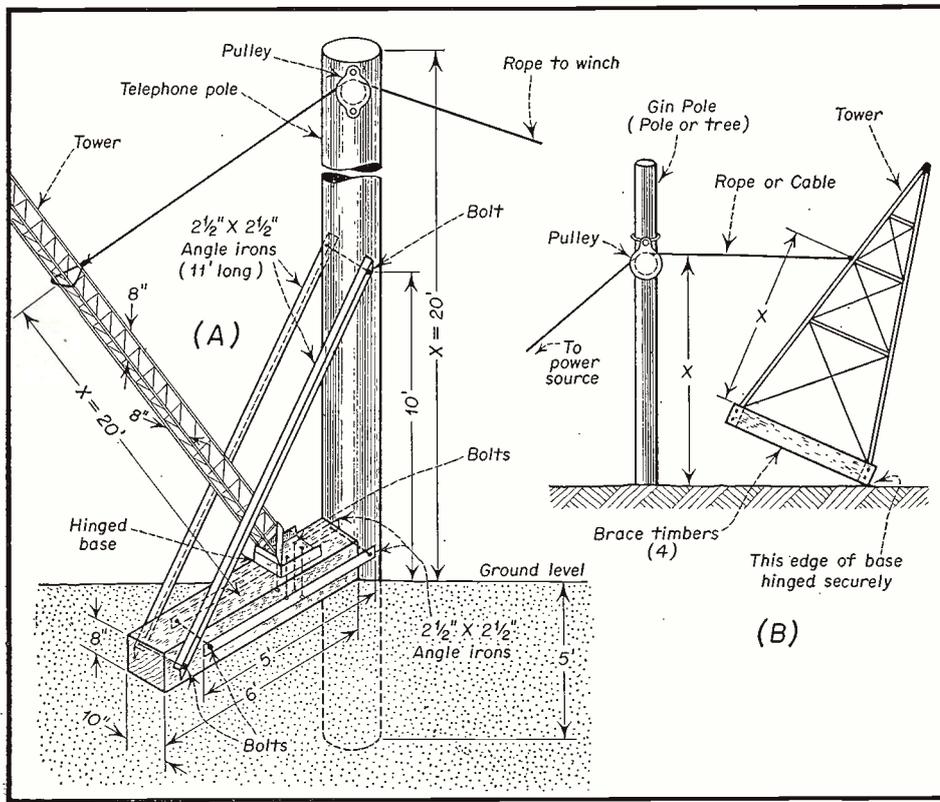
Gin pole details, showing dimensions and relative position of gin pole and mast to be raised.
